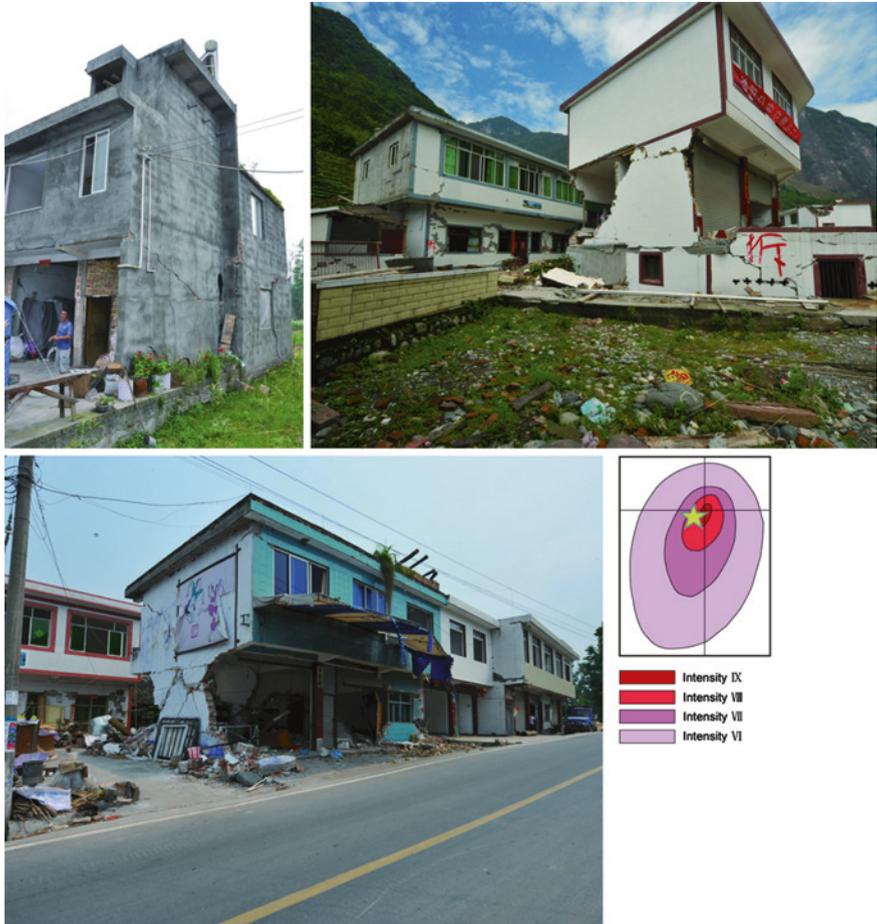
“Standing ruins” located in Longmen Town, Lushan. All these buildings were heavily damaged and irreparable but not collapsed
